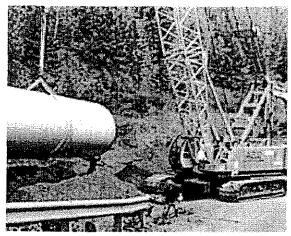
Installation of new penstock on compacted, shaped crushed rock bedding.
